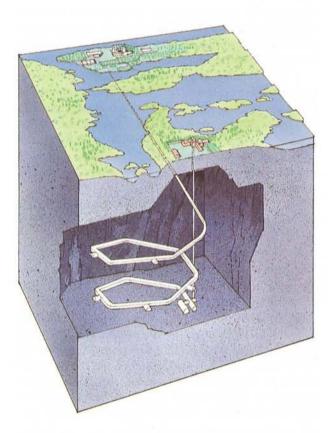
Facility layout of the Äspö Hard Rock Laboratory.
